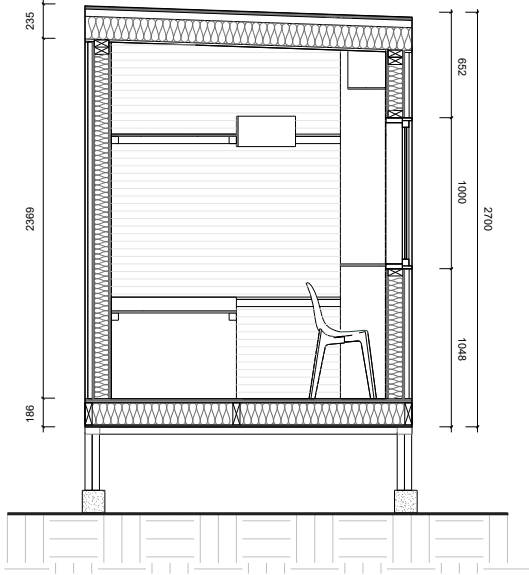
SECTION C-C PRIOR TO THE BUILT. SCALE 1:50
